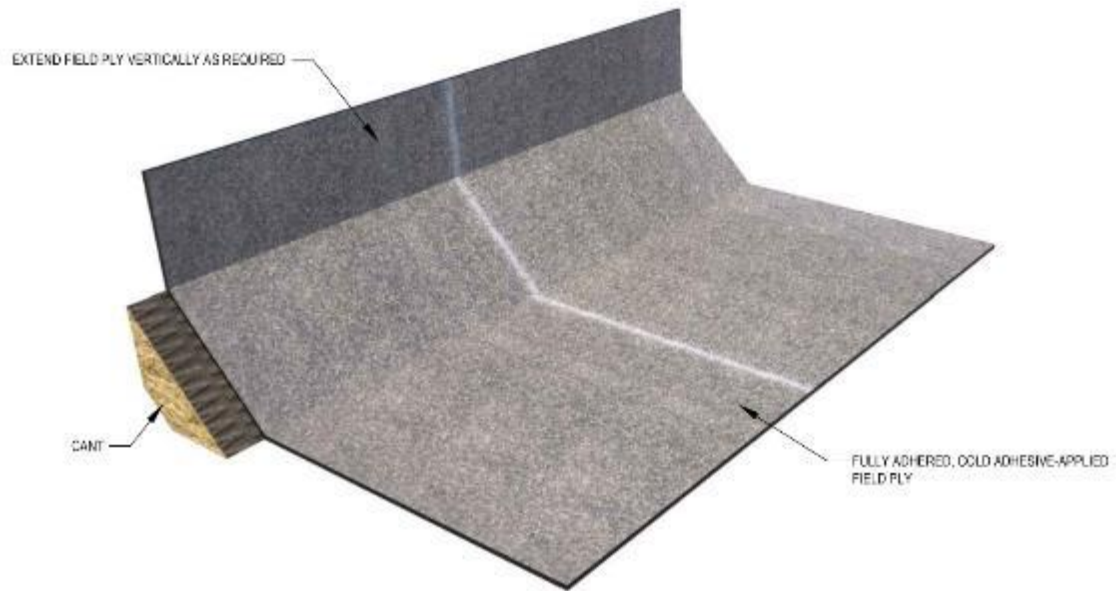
Fully Adhered, Cold Adhesive-Applied Vapor Retarder Termination at Wall/Curb
